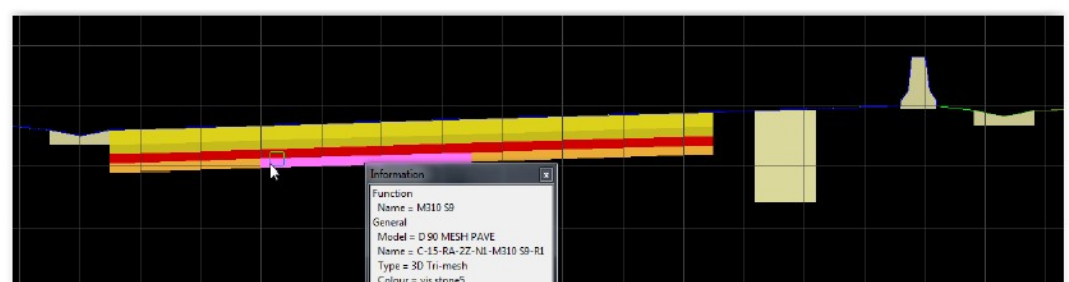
Example of pavement, barriers, kerbs, and anchor blocks trimeshes cross section
